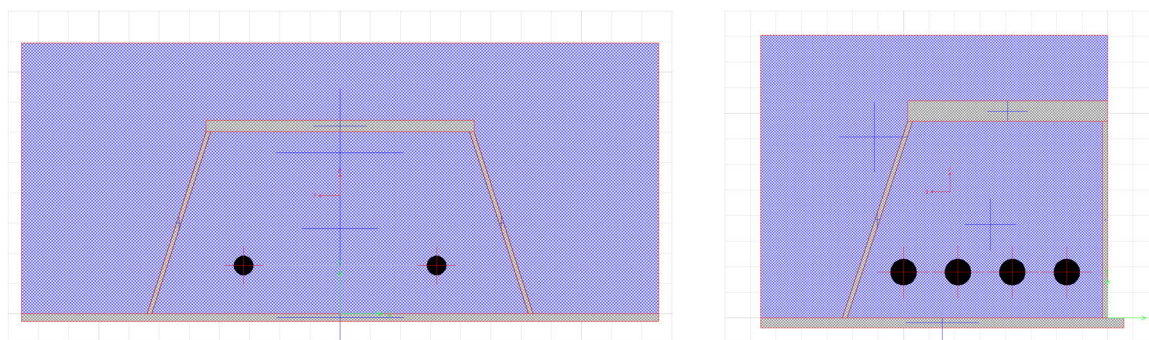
Typical cross sections of Deltabeams in SAP2000 Section Designer
